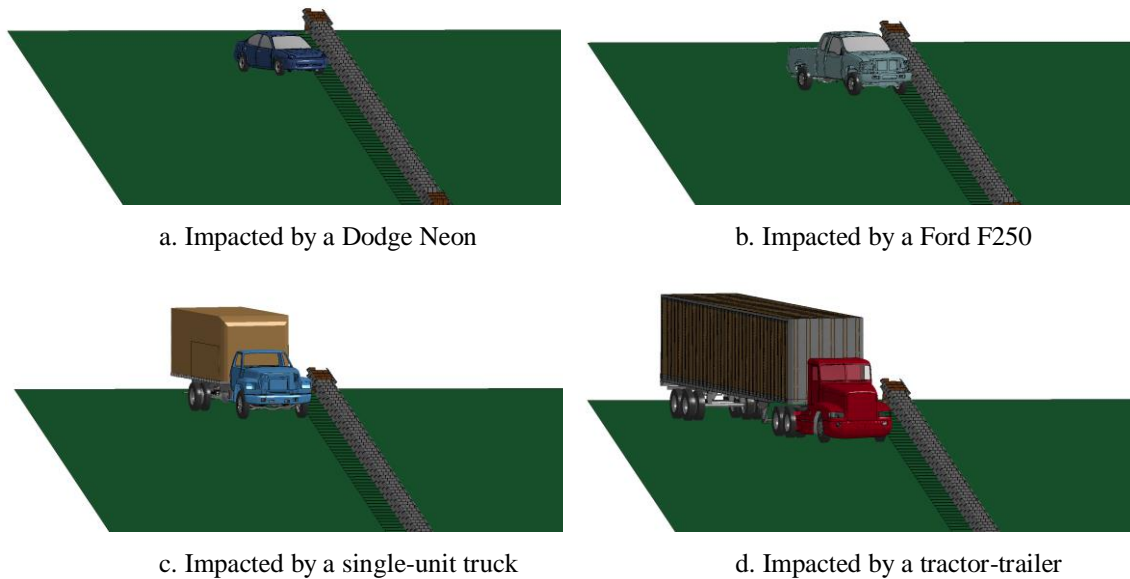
FE models of the double-faced 31-inch steel-blockout Thrie-beam guardrails.
